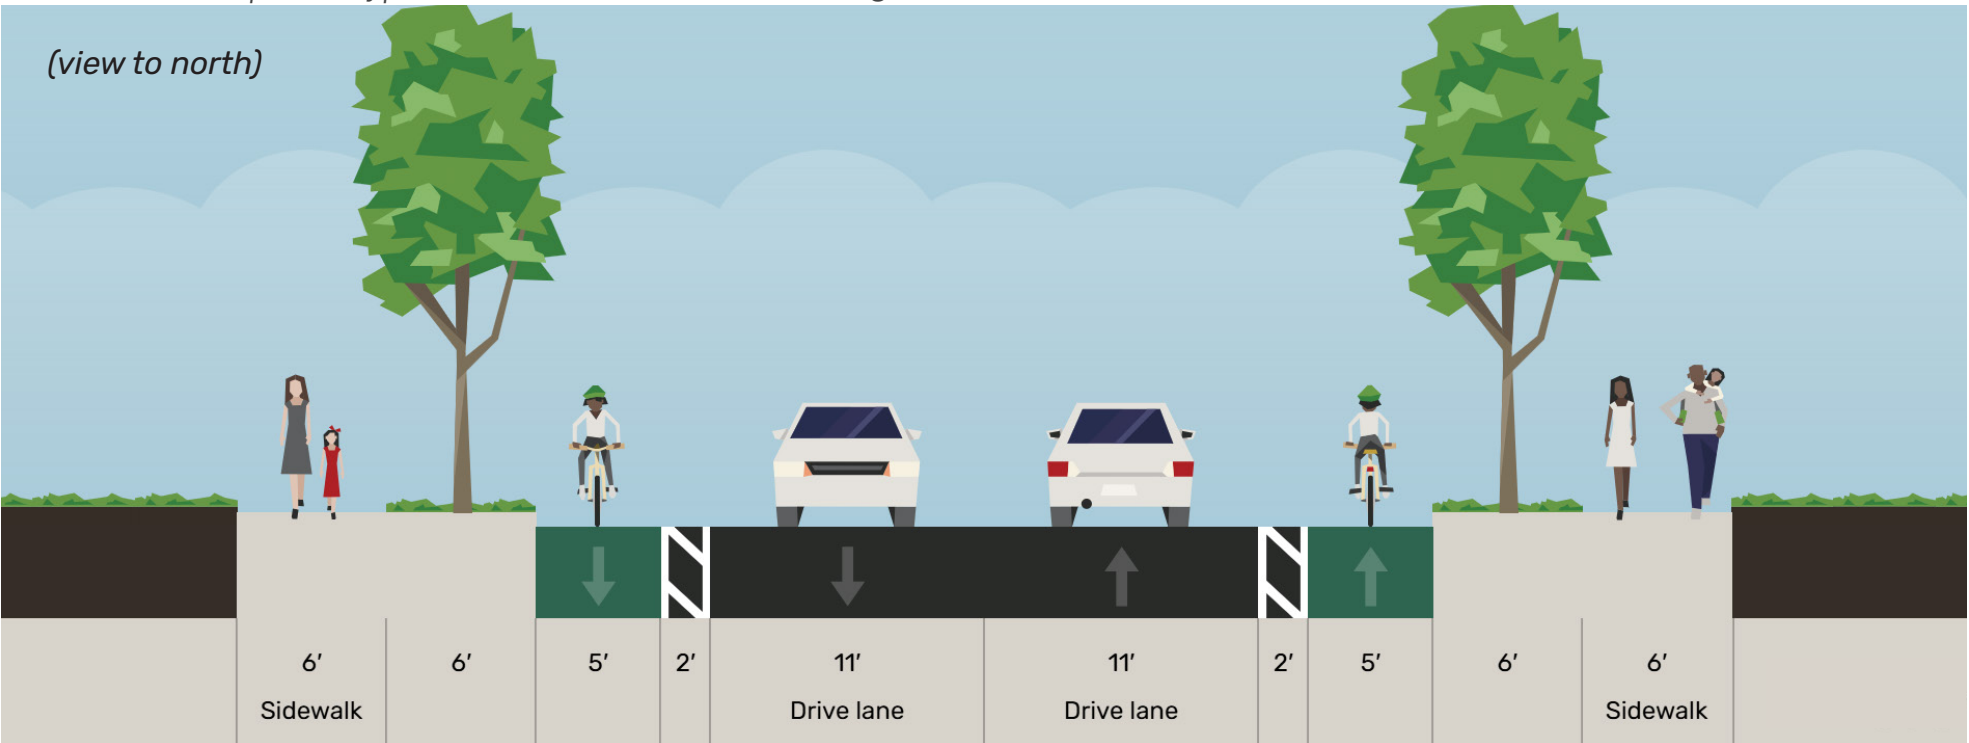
Proposed Typical Cross-Section on Tower Ridge Drive (Lake Sharon Drive to Brookview Drive) (60’ ROW)
